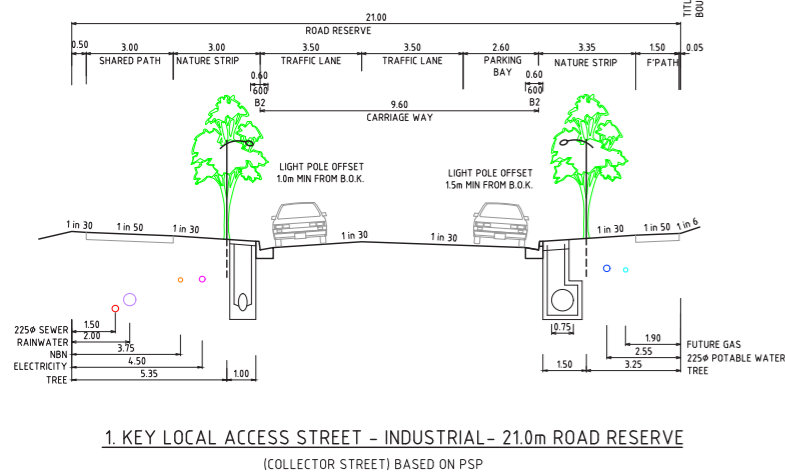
Typical Road Cross Section including conduit for Regional Rainwater Tanks
